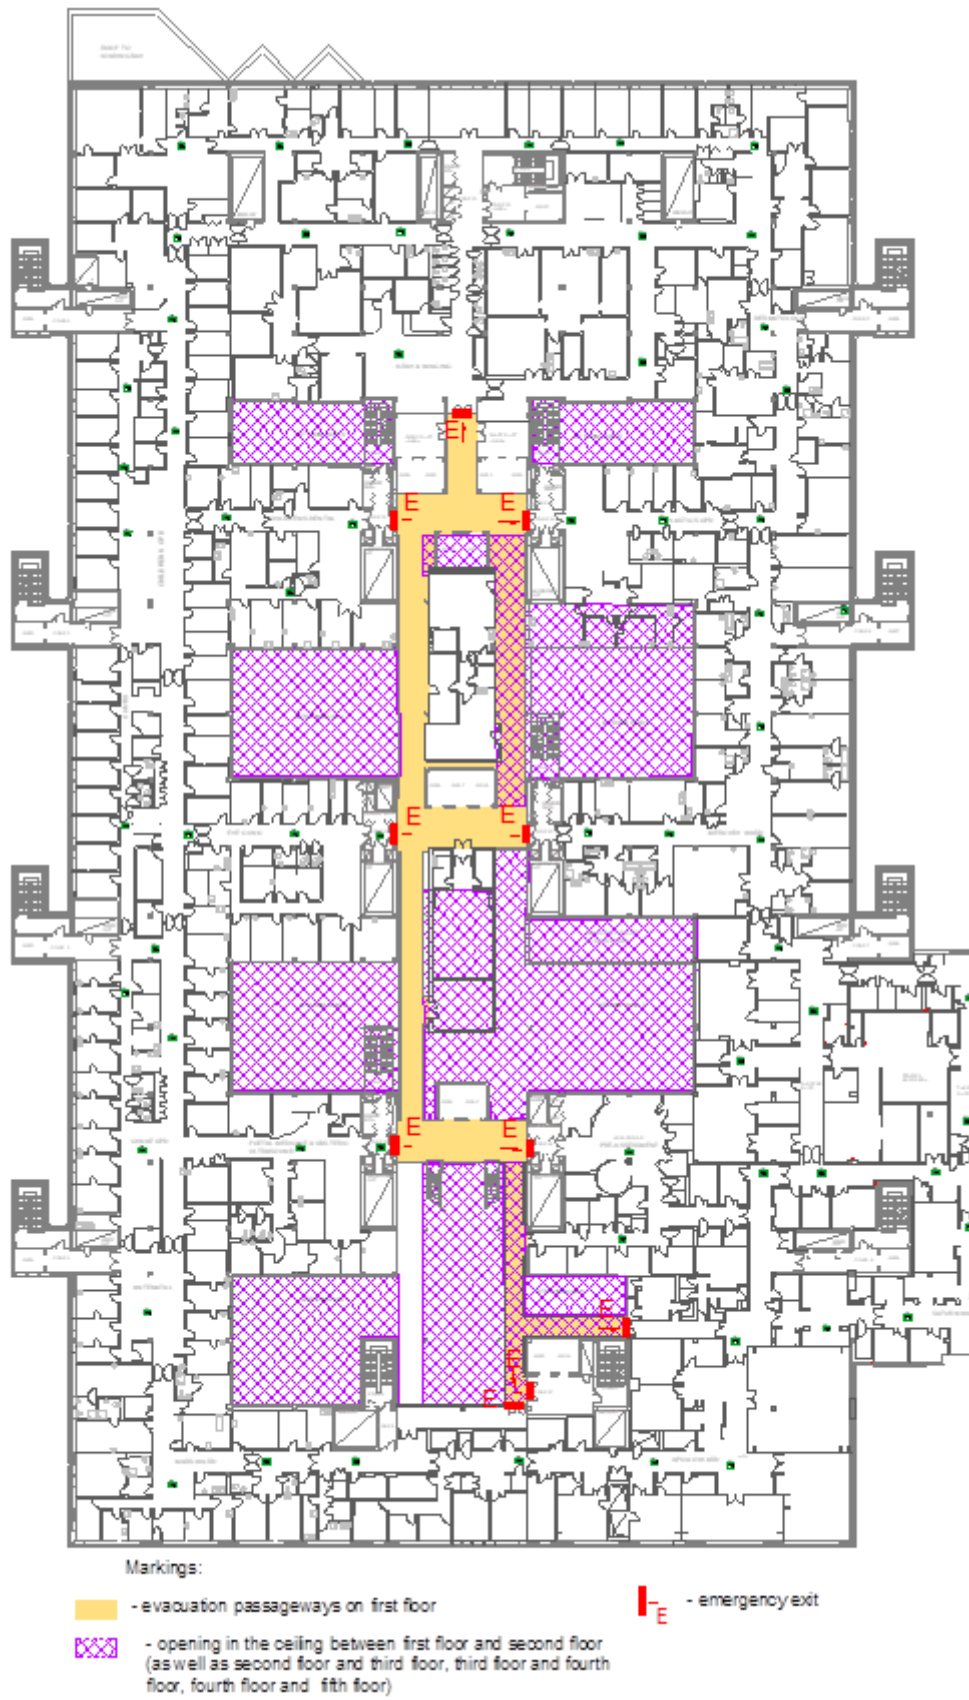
Hospital - repeatable floor (from first to fourth floor).
